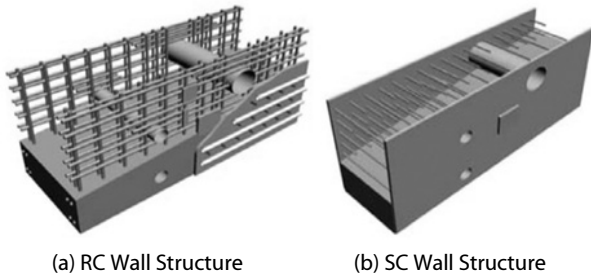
Structural Characteristics of RC Wall and SC Wall
